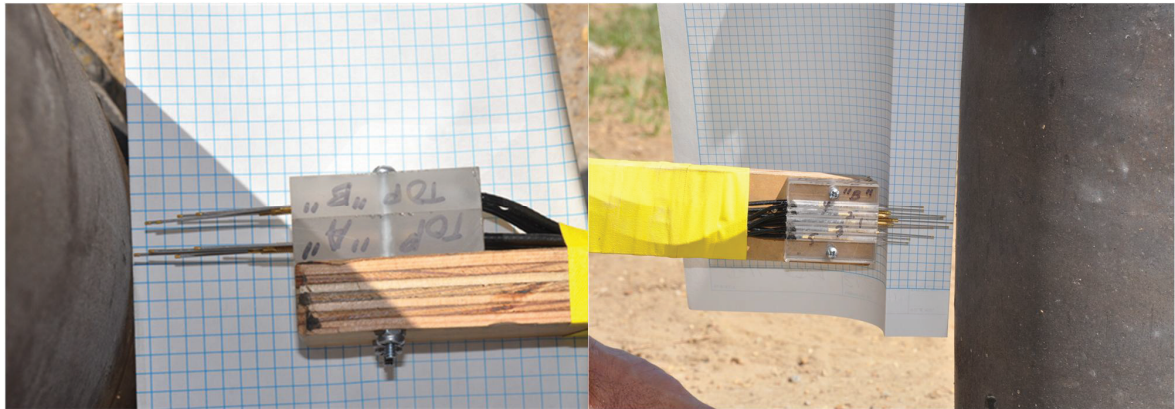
Pin Assembly on the Back of Specimen MSJC1
